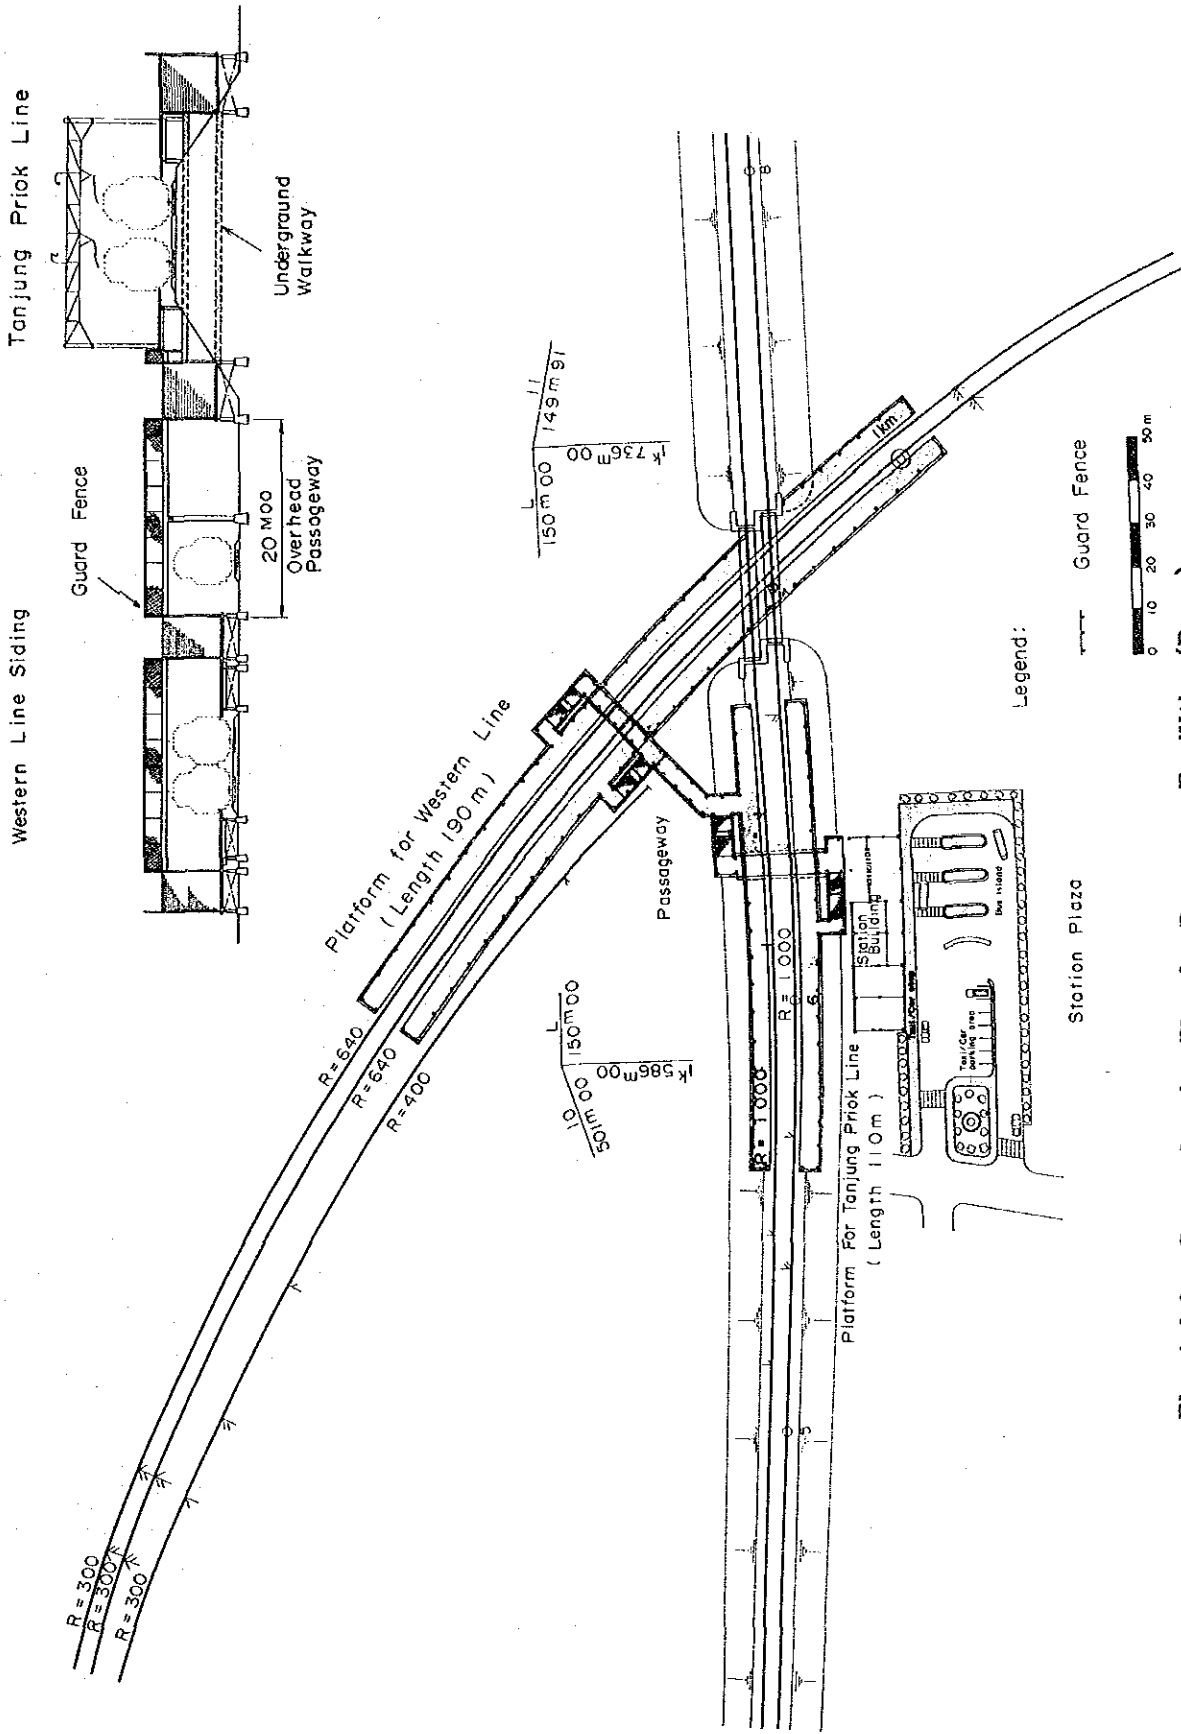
Comprehensive Plan for Passenger Facilities (P1-1s)
